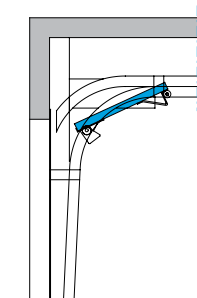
CHECK BASE PANEL POSITION - KPSIN DOOR TYPEFIG 55 CHECK BASE PANEL POSITION - KPSIS DOOR TYPEFIG 56 CHECK BASE PANEL POSITION - KPSIV DOOR TYPEFIG 57 CHECK BASE PANEL POSITION - KPSIR DOOR TYPE
